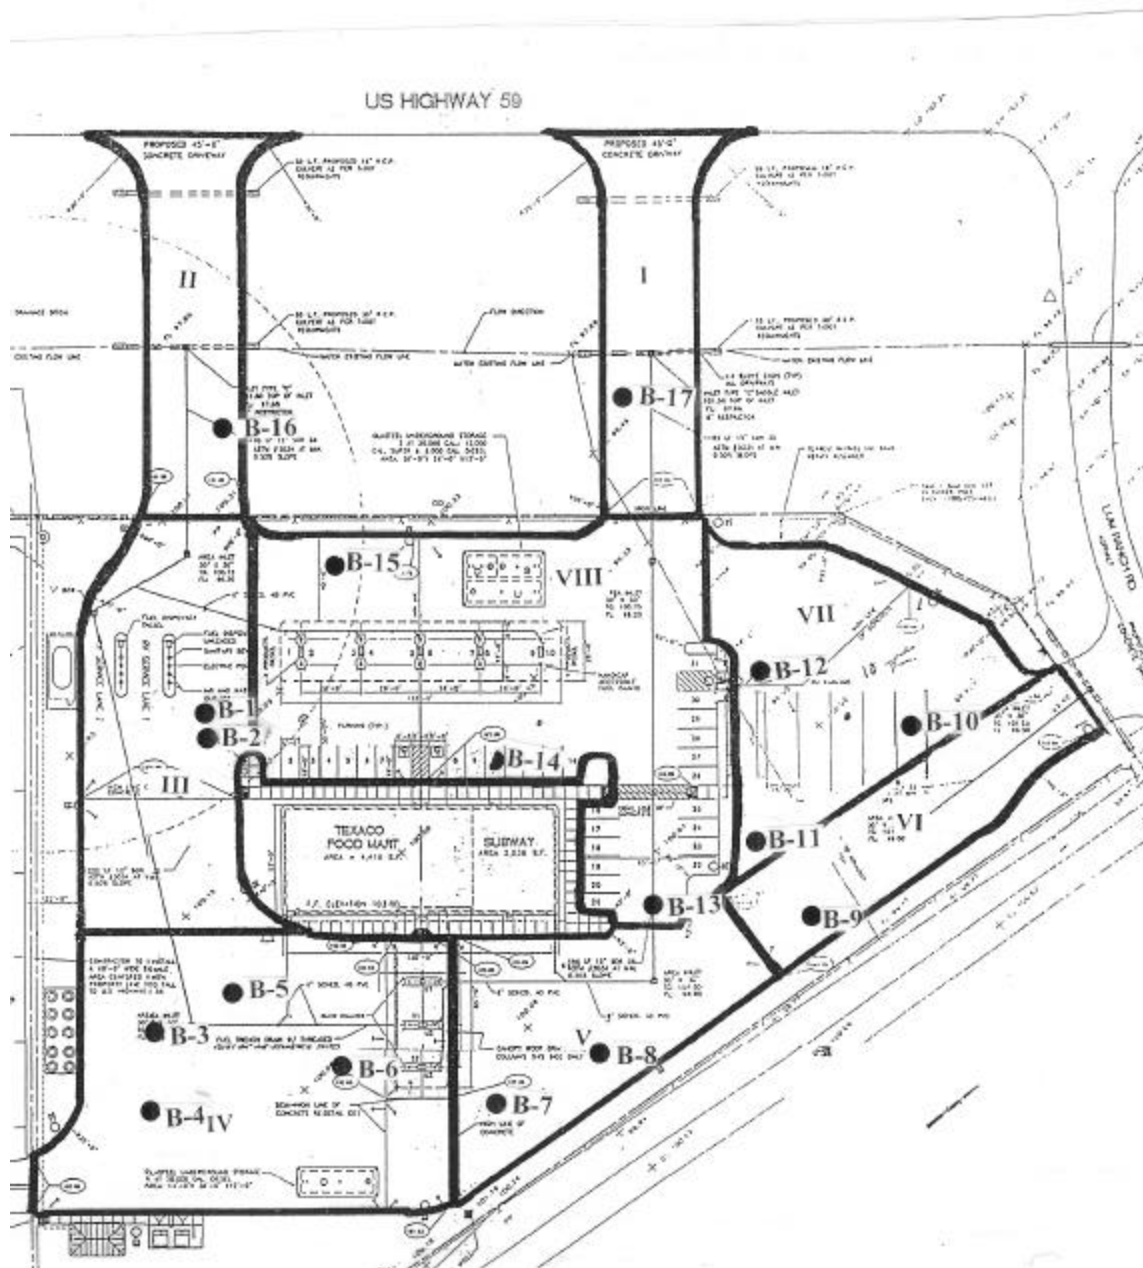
Plan of Borings (Boring locations and dimensions are approximate.)
